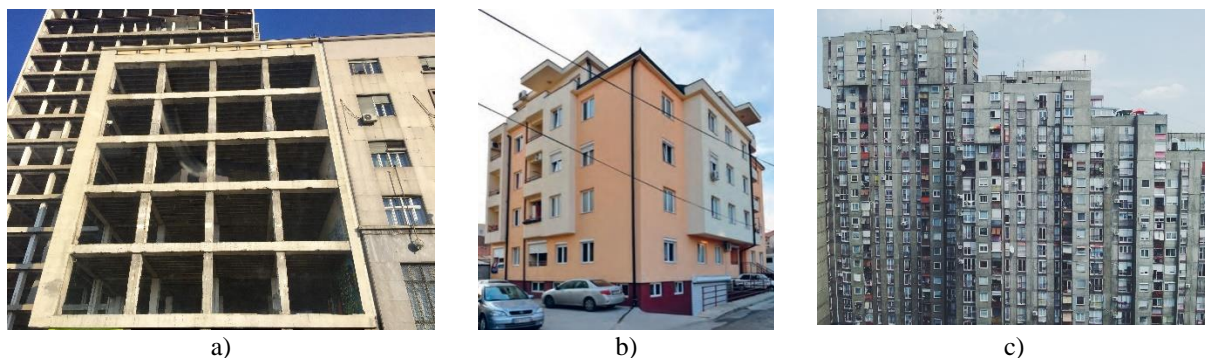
Examples of RC building typologies from Belgrade, Serbia: a) RC1 - original office of “Energoprojekt” consulting firm; b) RC2 – a multifamily residential building [25] and c) RC3 – high-rise prefabricated large panel RC buildings, New Belgrade
